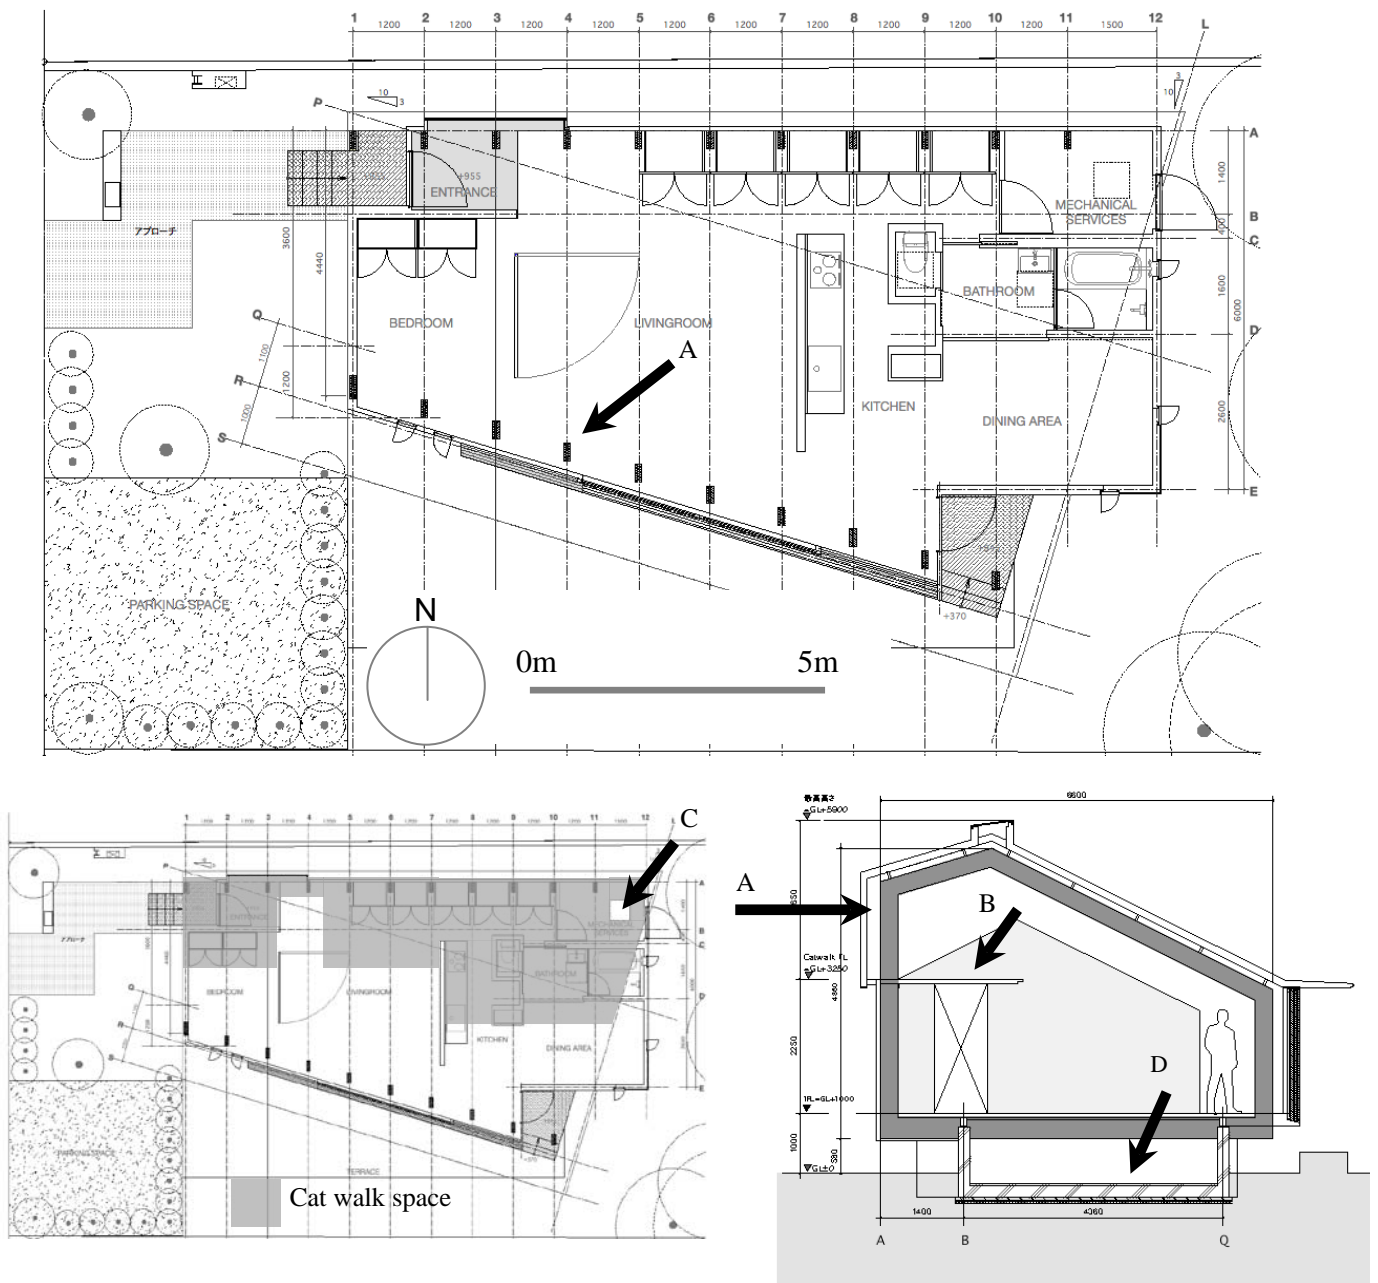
Floor plan and cross section of the experimental house (Ocha House).
